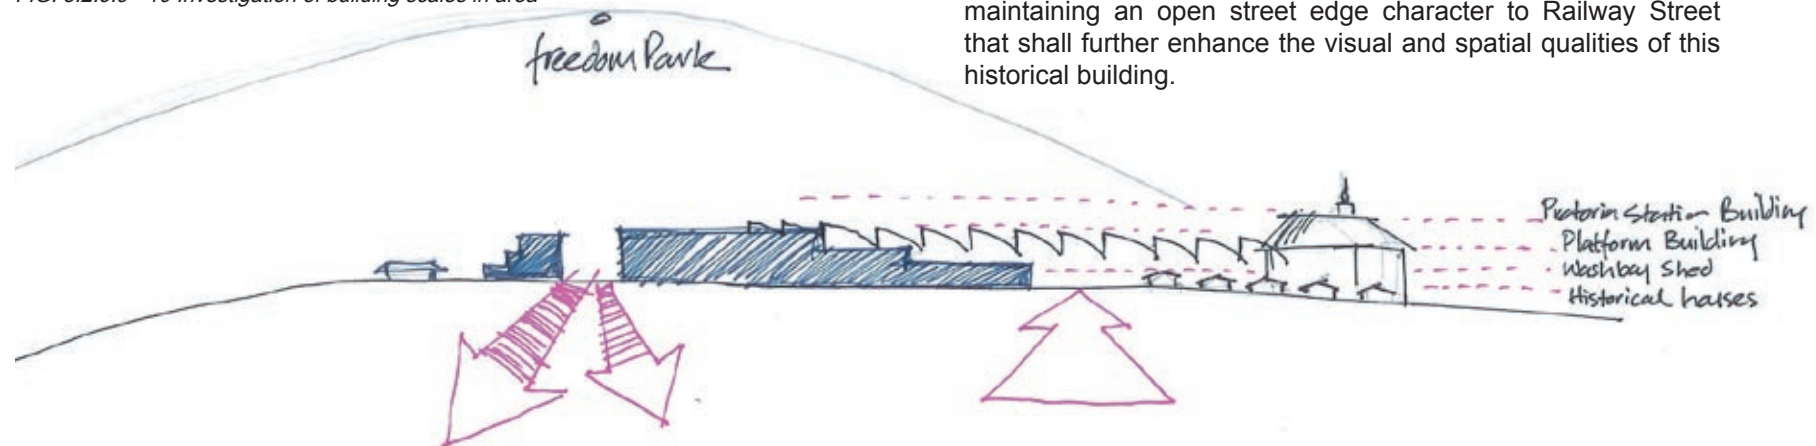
Establishing the street-edge elevation of the proposed development
